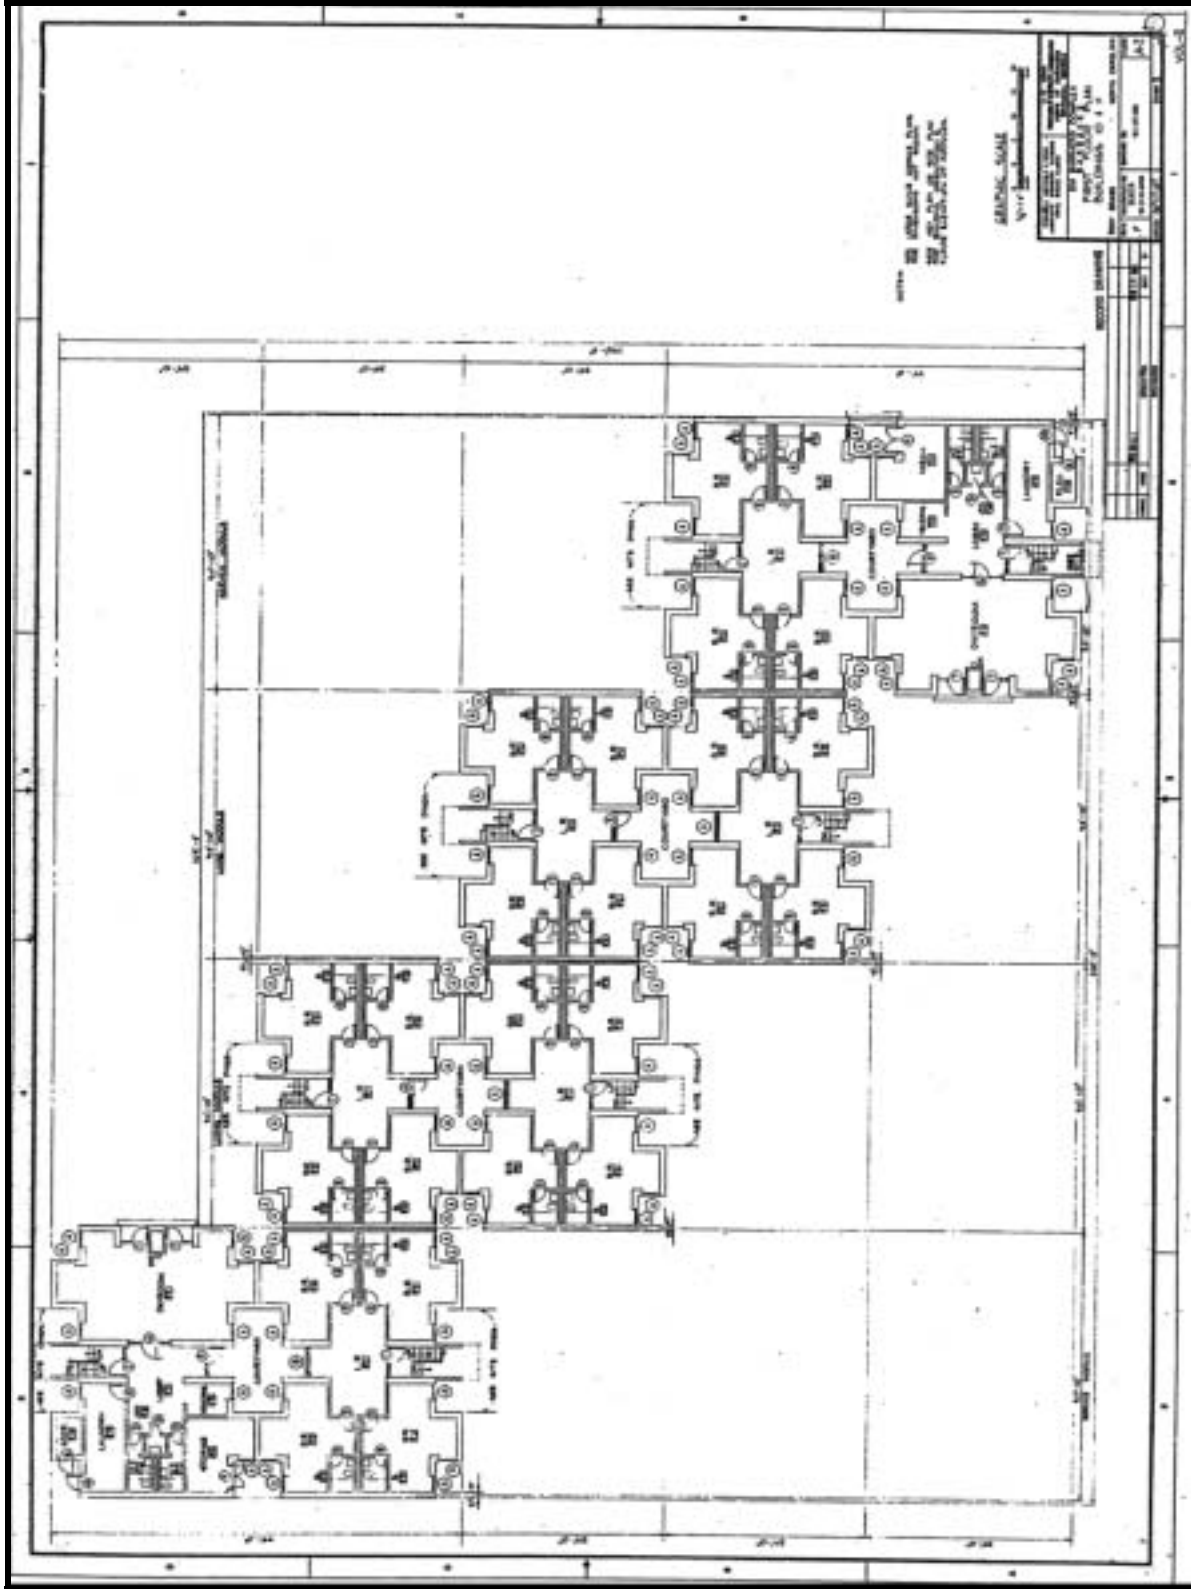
98 Four-building LBC&W barracks, first floor plan, Ft. Bragg (ca. 1972, revised 1981) (Engineering, Ft. Bragg).
